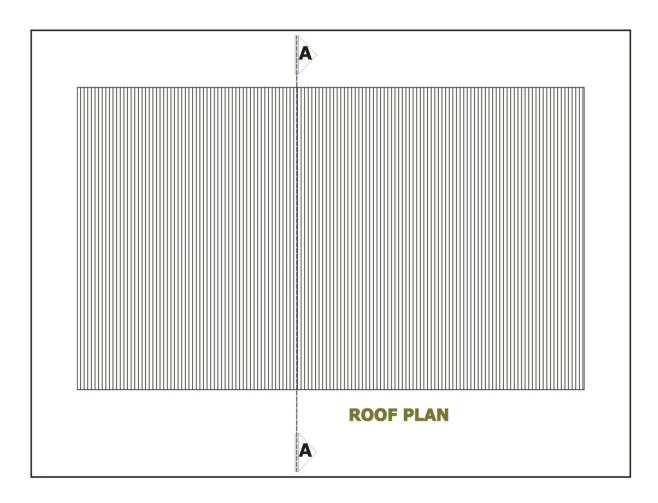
Prototype Botanical Garden Structure Office Building Roof Plans.
